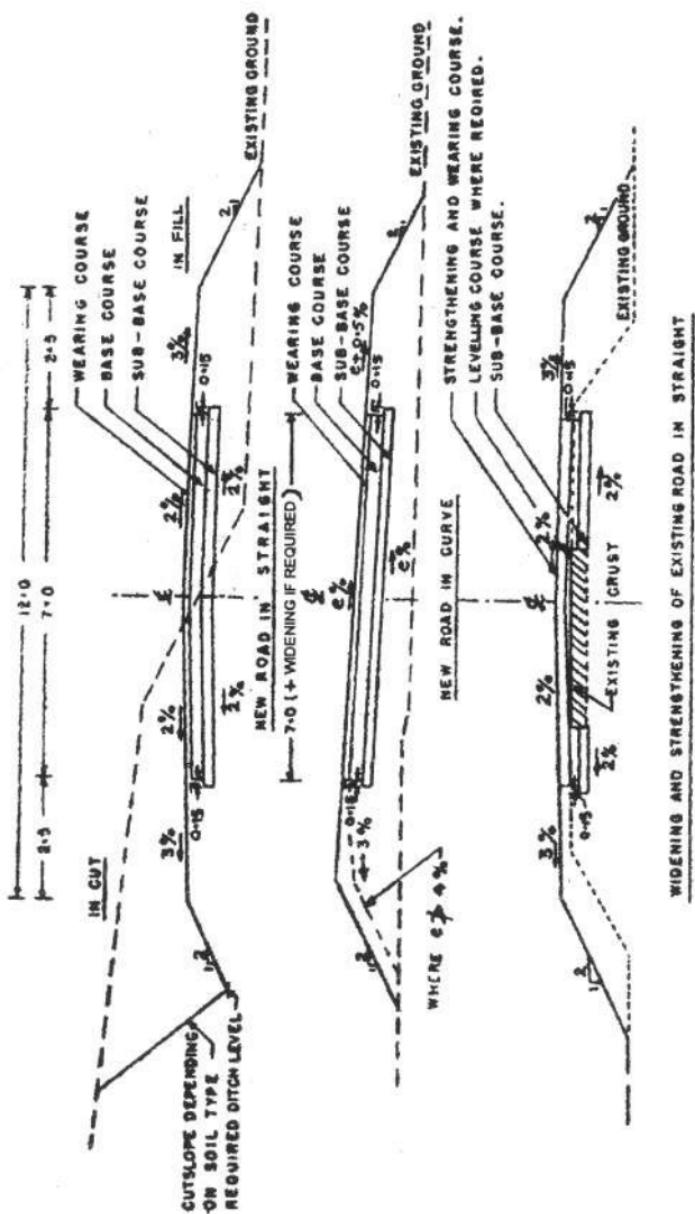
Typical cross-sections for two-lane road in plain/rolling terrain
